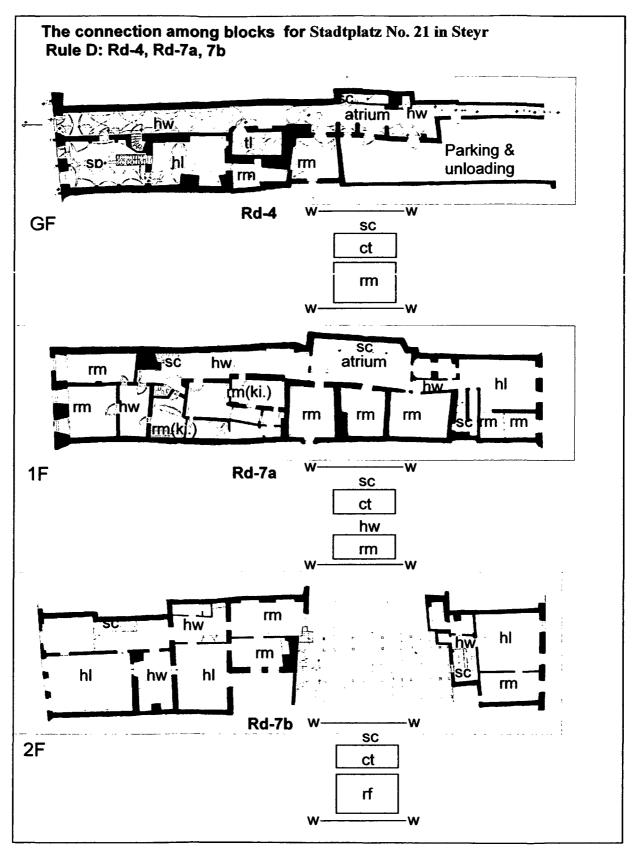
22 Rule D for the floor plans at Stadtplatz No. 21 in Steyr
